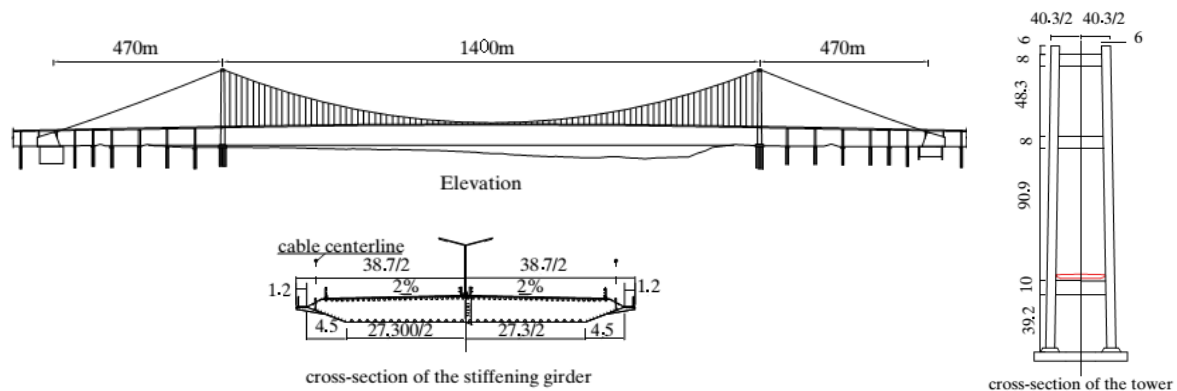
1400 m suspension bridge scheme (Unit: m)
